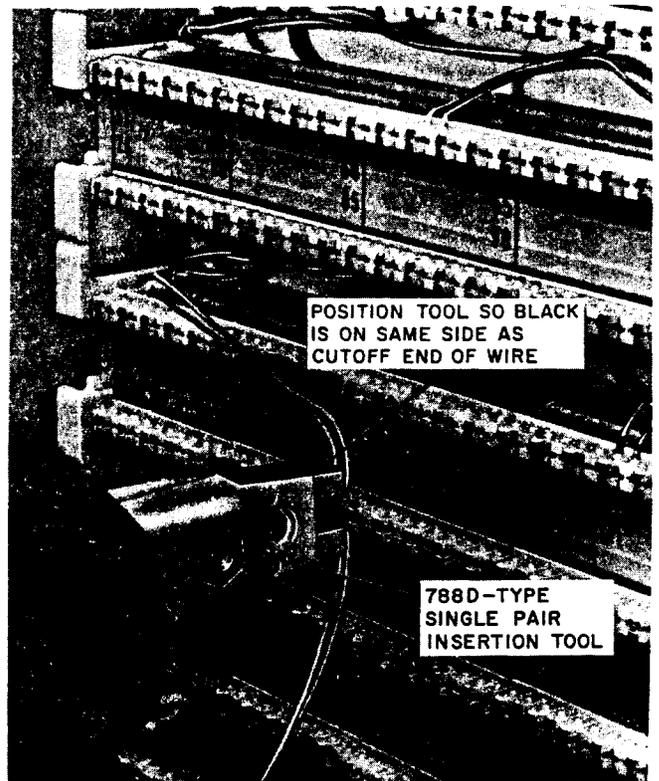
Seating and Cutting Cross-Connecting Wire Into Connecting Block
